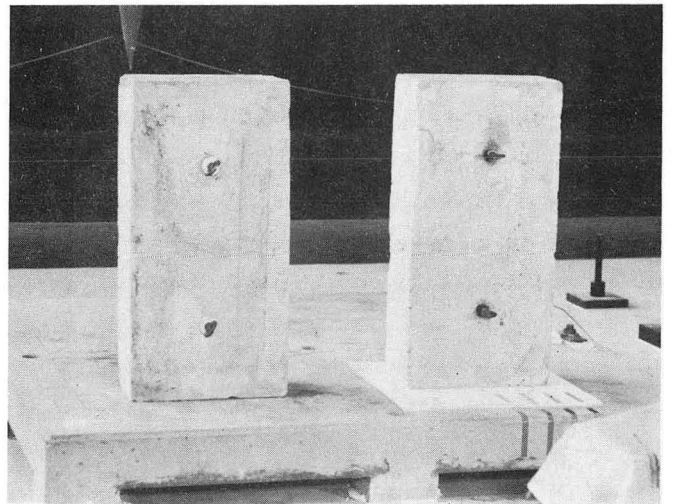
Effect of friction on response mode. (Left block, concrete on concrete, rocked and was damaged. Right block, teflon on teflon, slid with no damage.)
